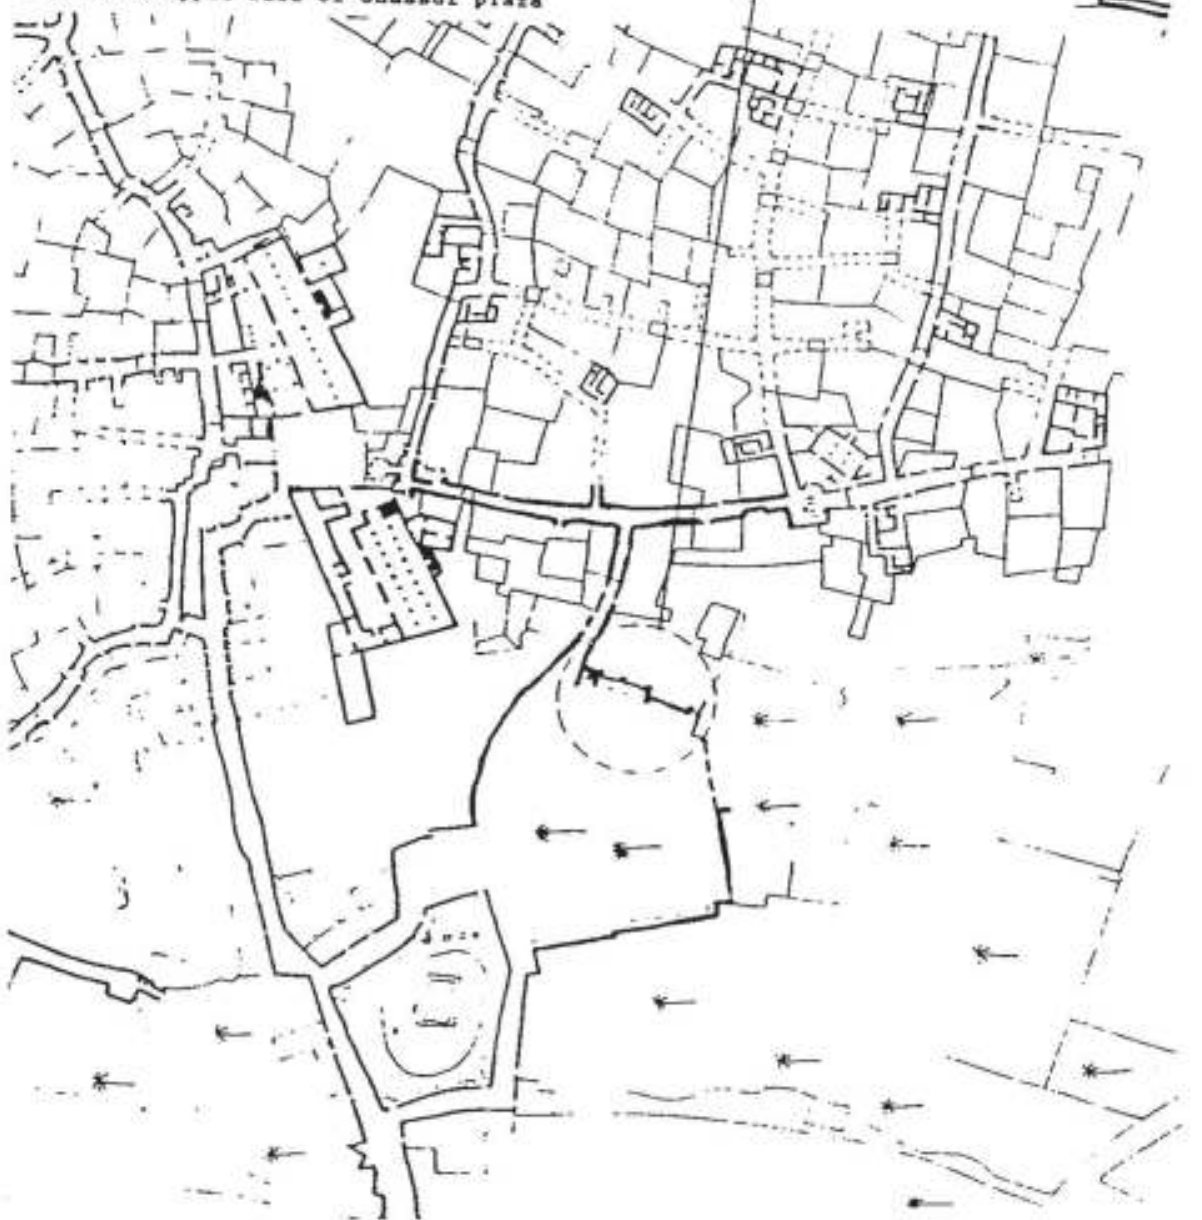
Site plan of Ain Alfaras and Ghassuf plaza
